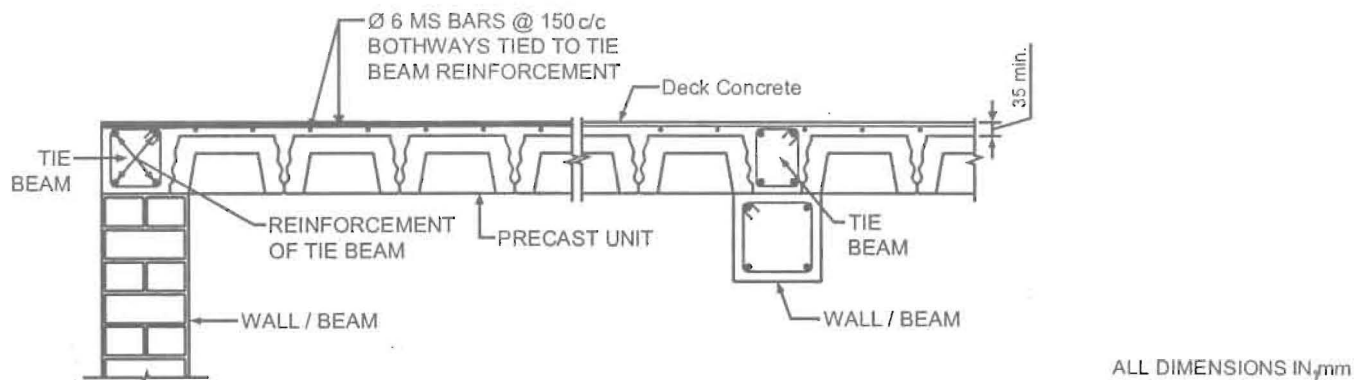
CONNECTION OF CHANNEL UNIT FLOOR/ROOF (WITH DECK CONCRETE) WITH TIE BEAM
